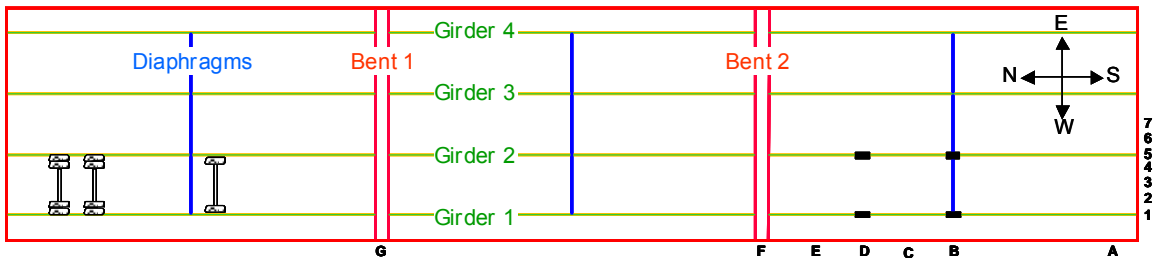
General positioning of BDI gages on the bottom of girders (plan view)
